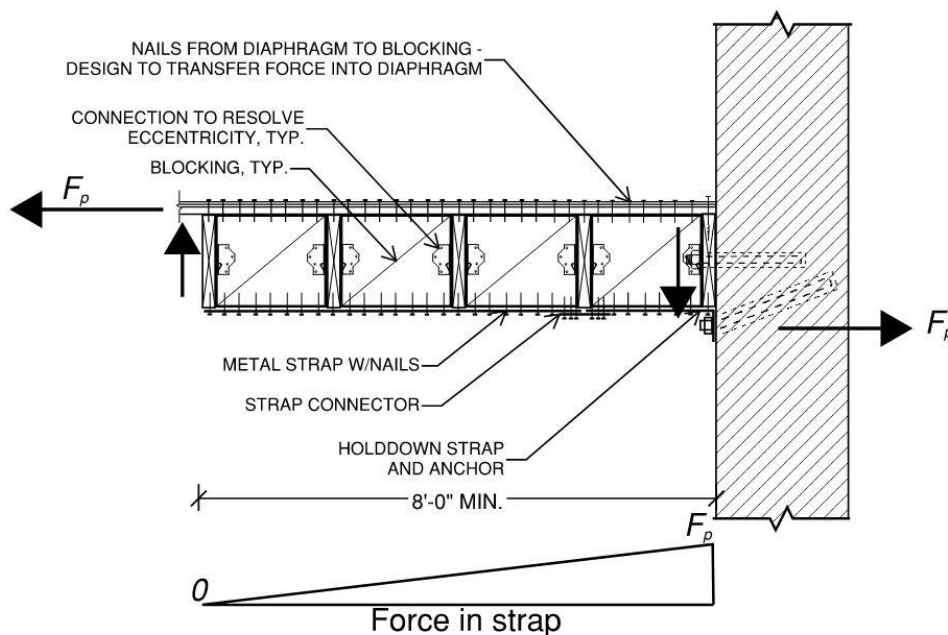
XXXX Out-of Plane Force Transfer from Wall to Diaphragm
